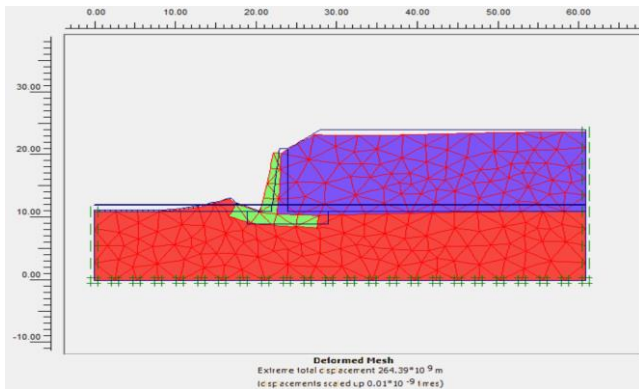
Deformed mesh slope with reinforcement soil retaining wall
